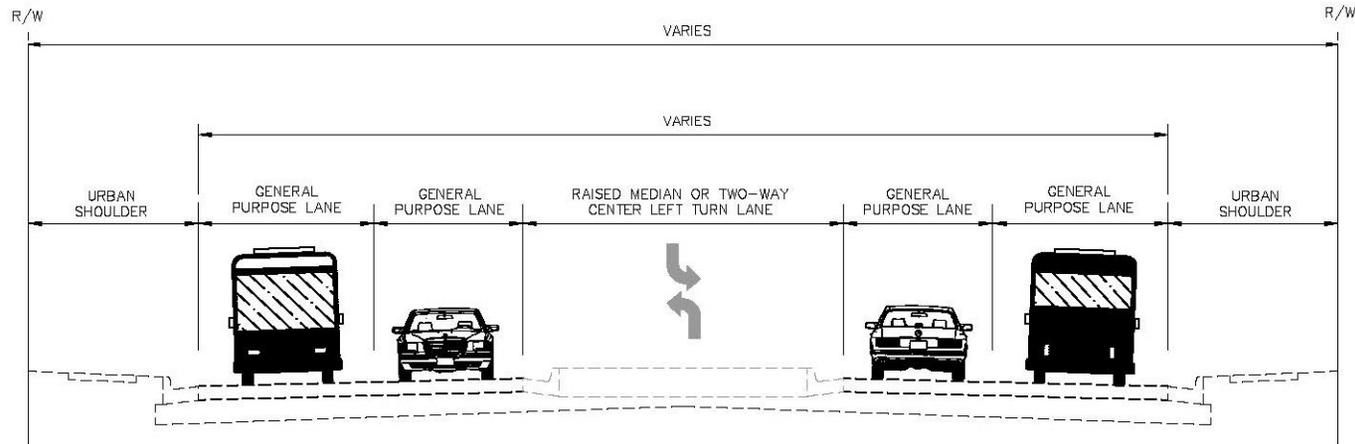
Existing Typical Section on Cumberland Boulevard
